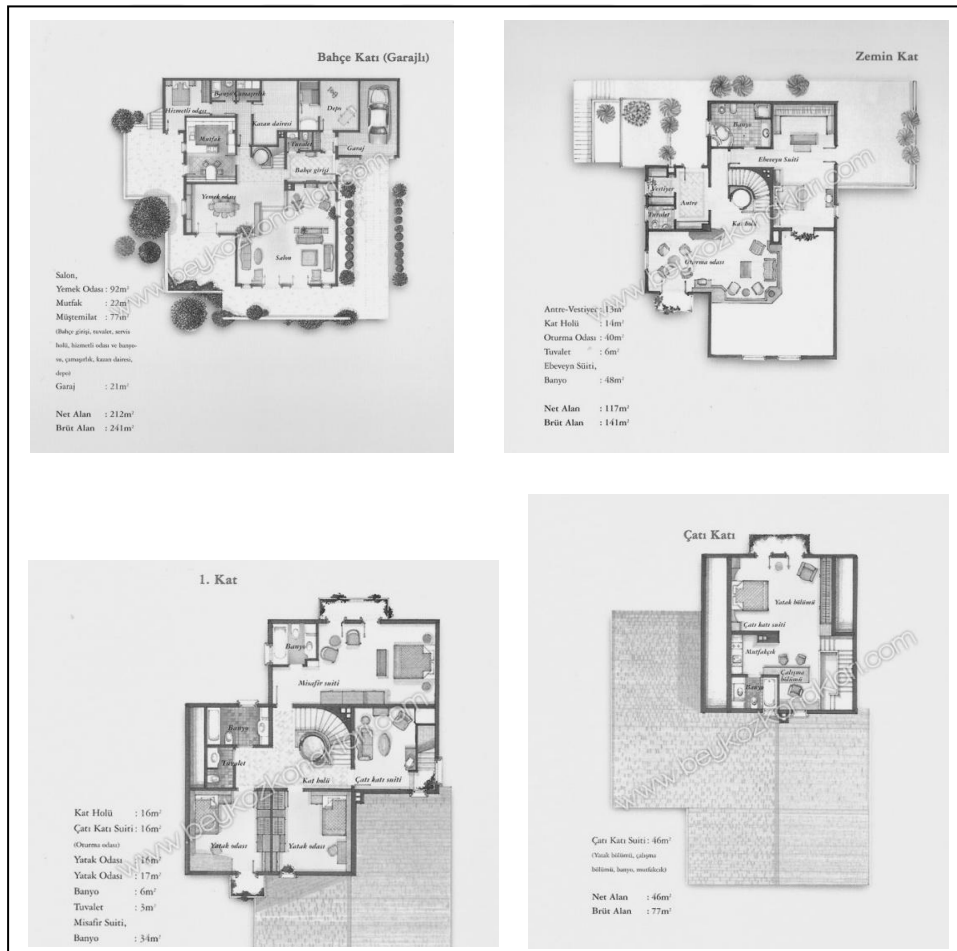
Beykoz mansions - floor plans of c type villa, 2000s [98]
